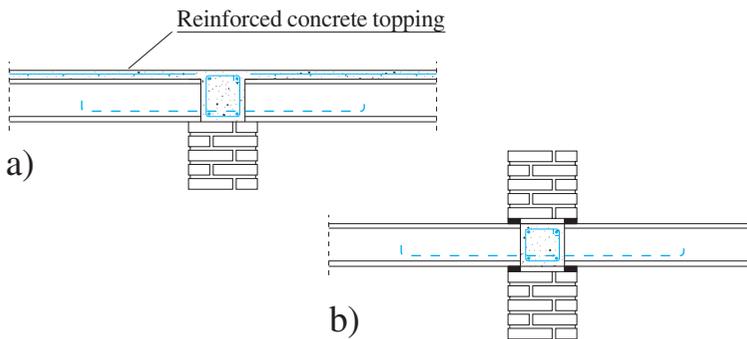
Correct building steps that give the floor the freedom of simple support:
